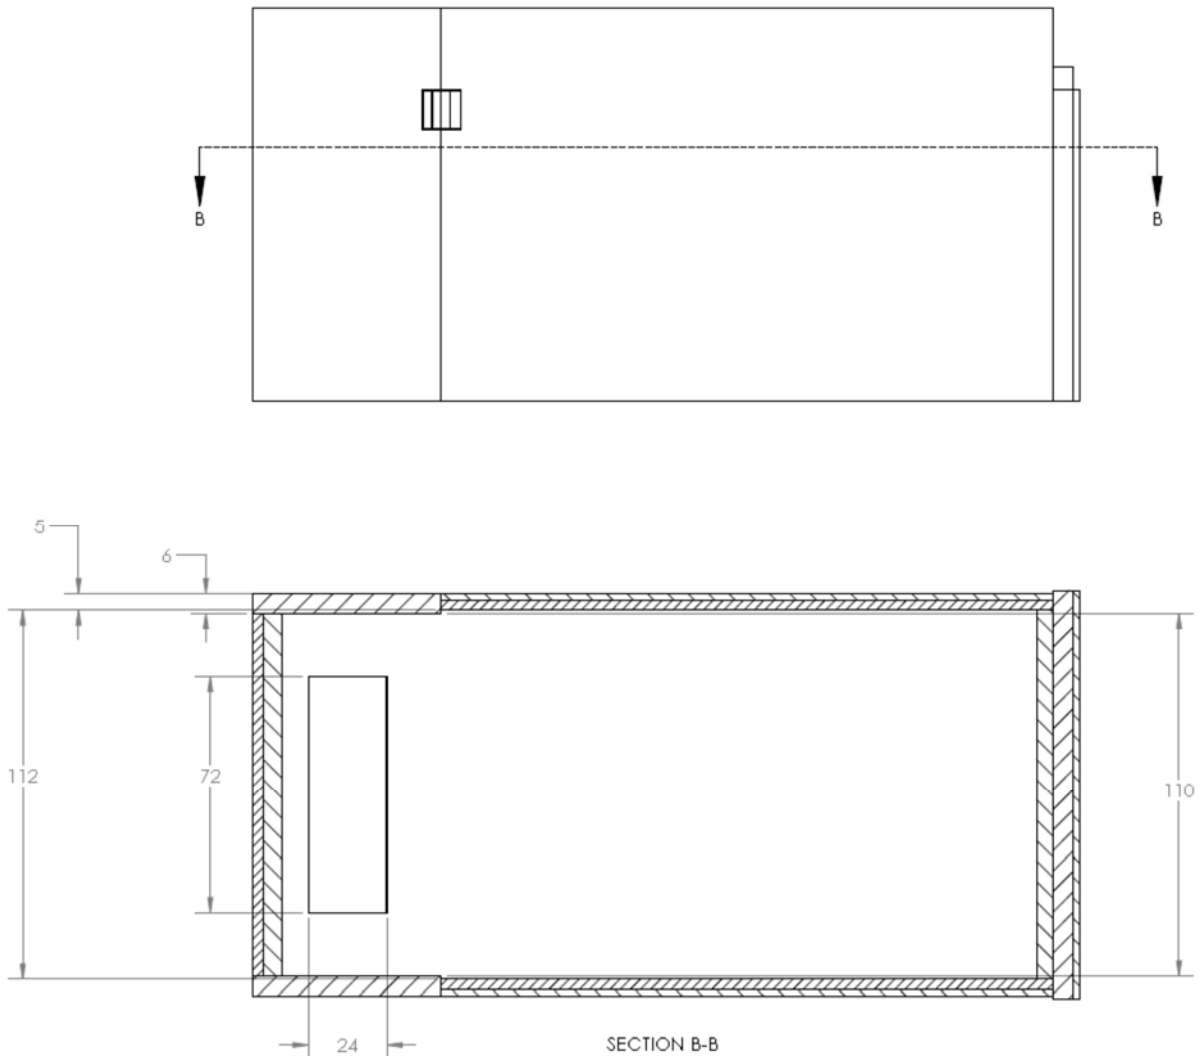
Plan View (Section) and Side Elevation (Section) of Test Room (Units in inches)
